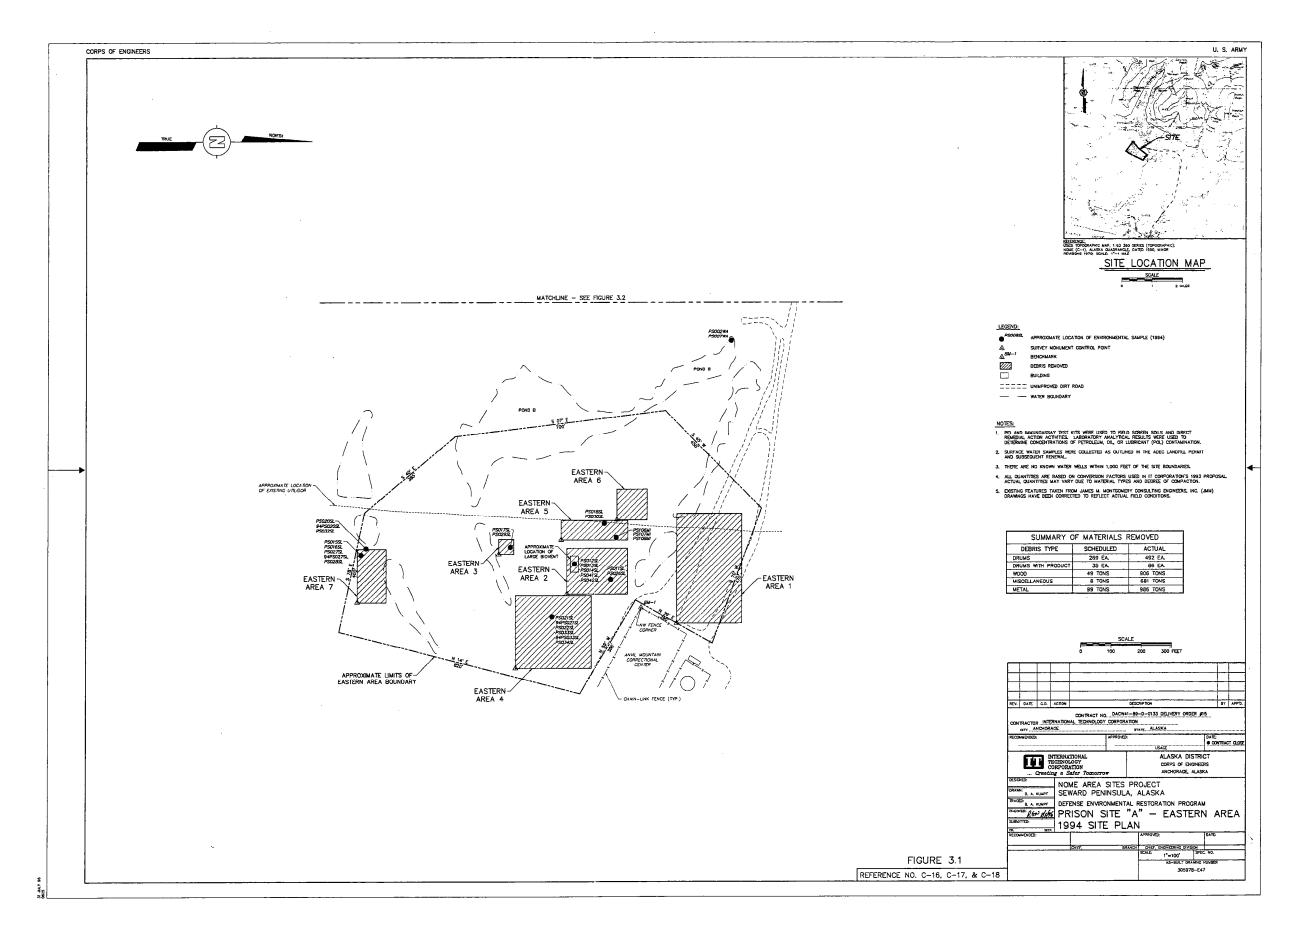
Prison Site 'A' Eastern Area 1994 Site Plan
